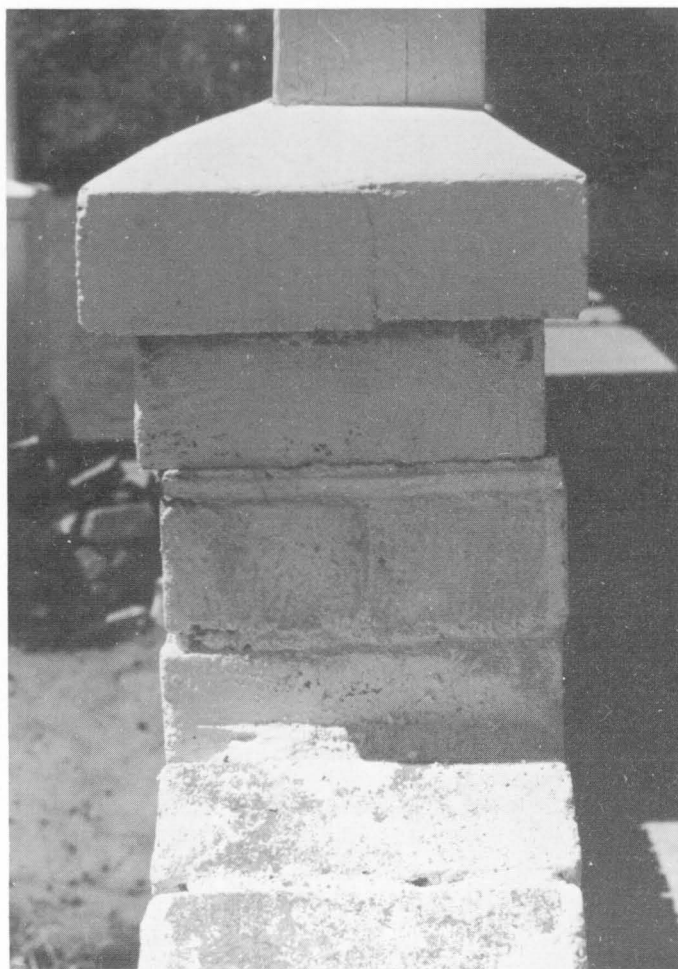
Sheared brick pier under verandah post, 20 mm horizontal movement.
